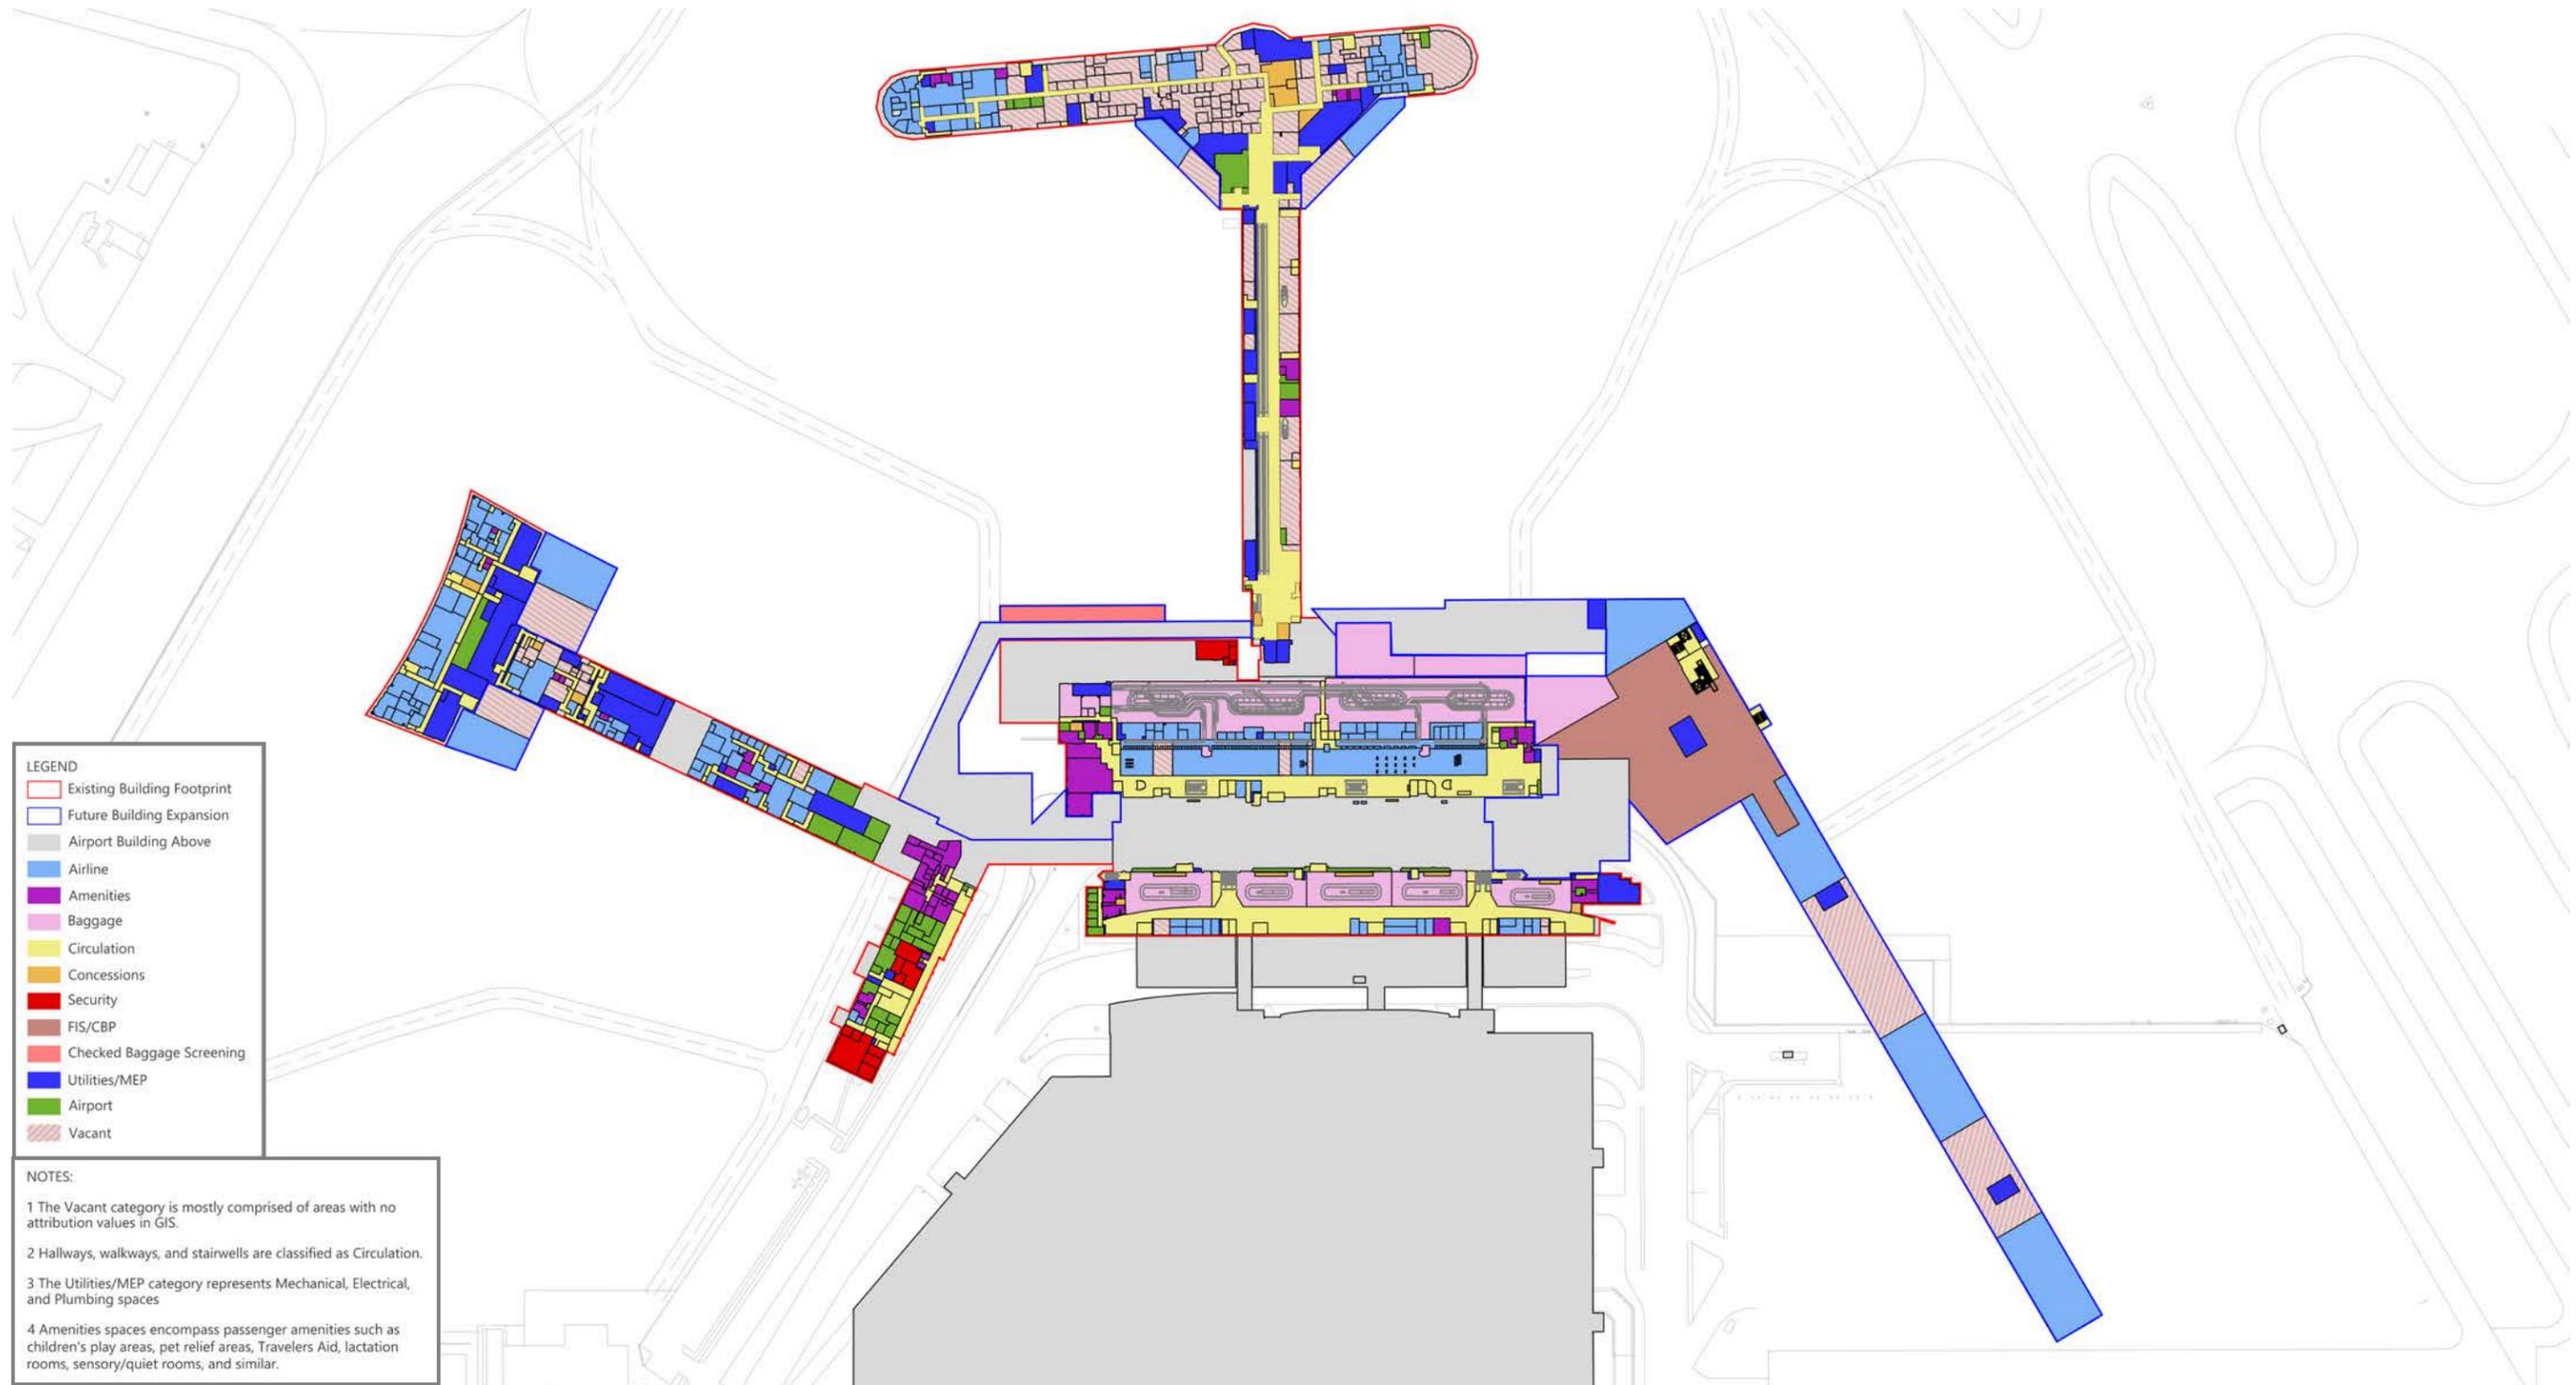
REFINED TERMINAL AREA DEVELOPMENT PLAN
